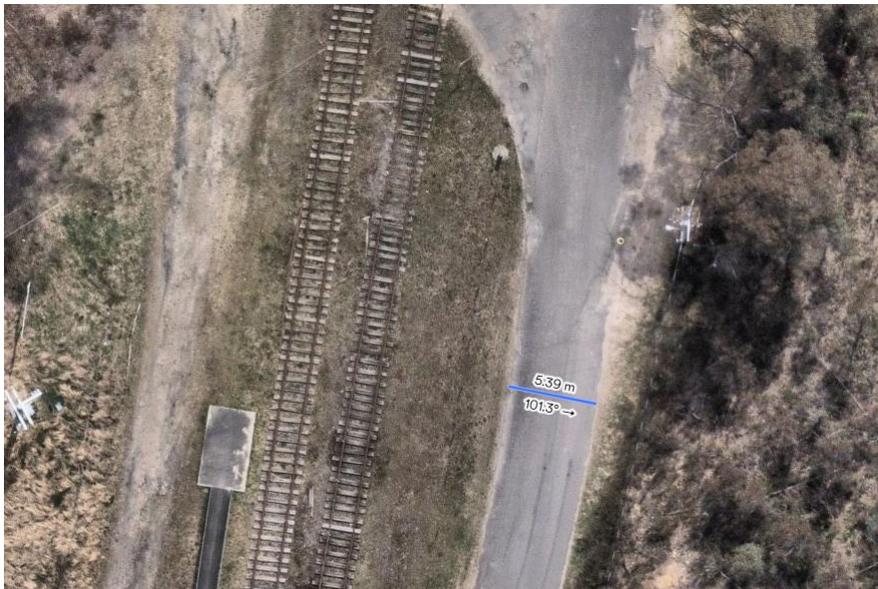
Section of State Mine Gully Road between Atkinson Street and the development site
